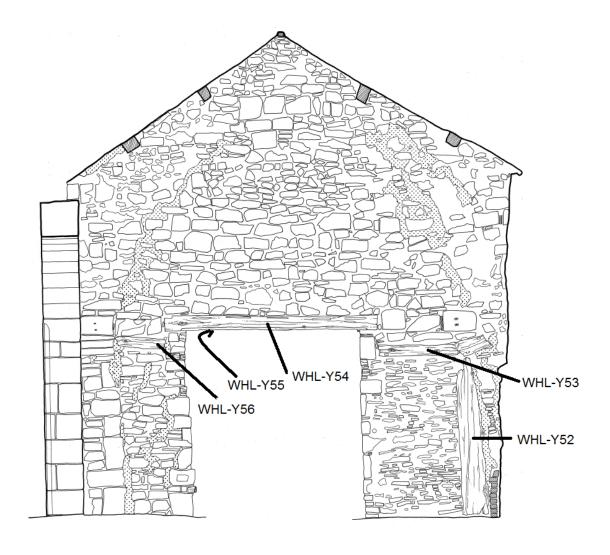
Dividing wall between carriage house and lobby (east face), showing the location of samples WHL-Y52–56 (LUAU 1997)
